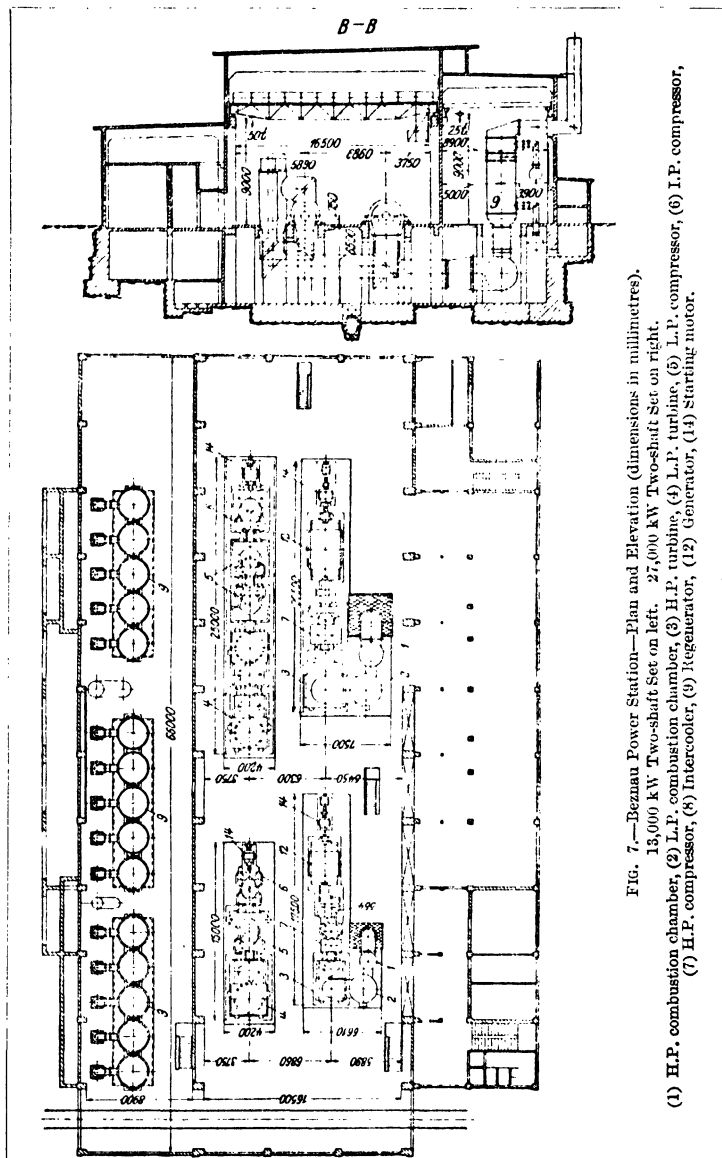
Beznau Power Station—Plan and Elevation (dimensions in millimetres).
